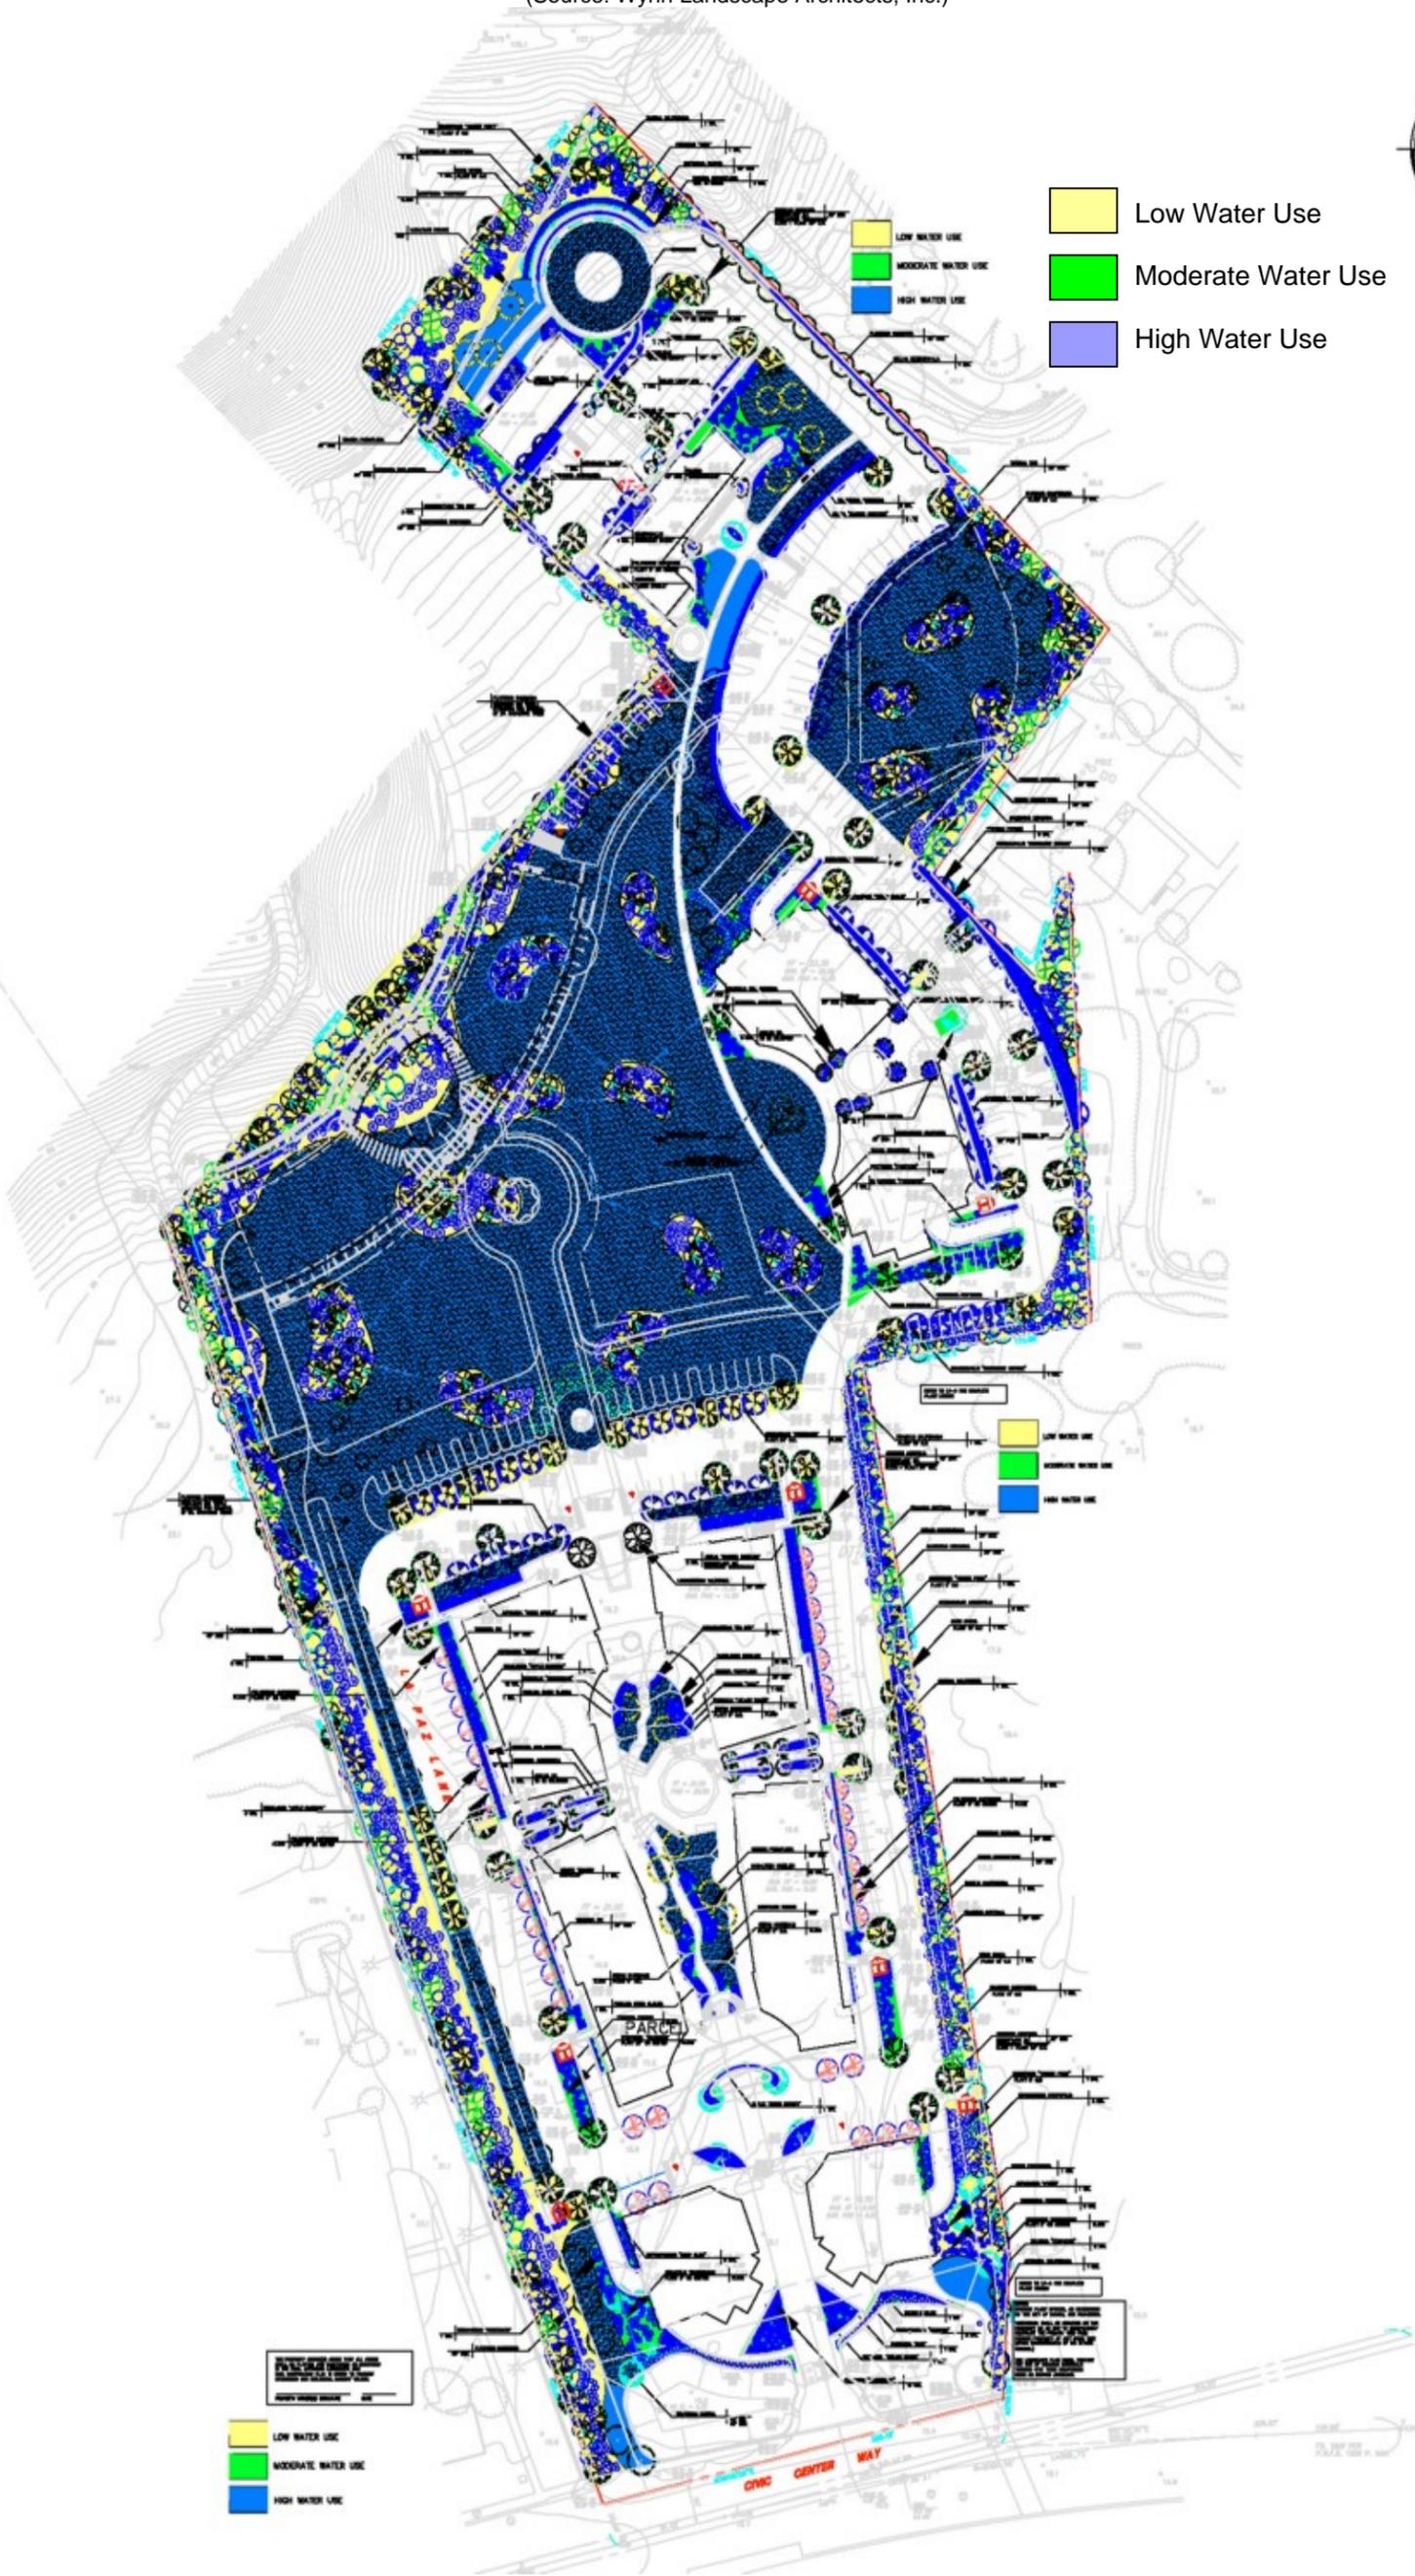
PROPOSED LANDSCAPING DESIGN – ALTERNATE PLAN
